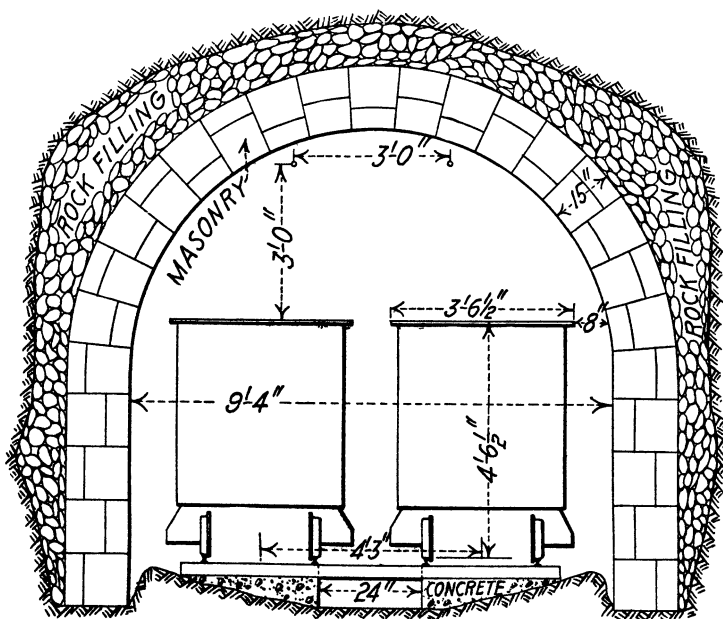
CROSS SECTION THROUGH TIGER TUNNEL.
